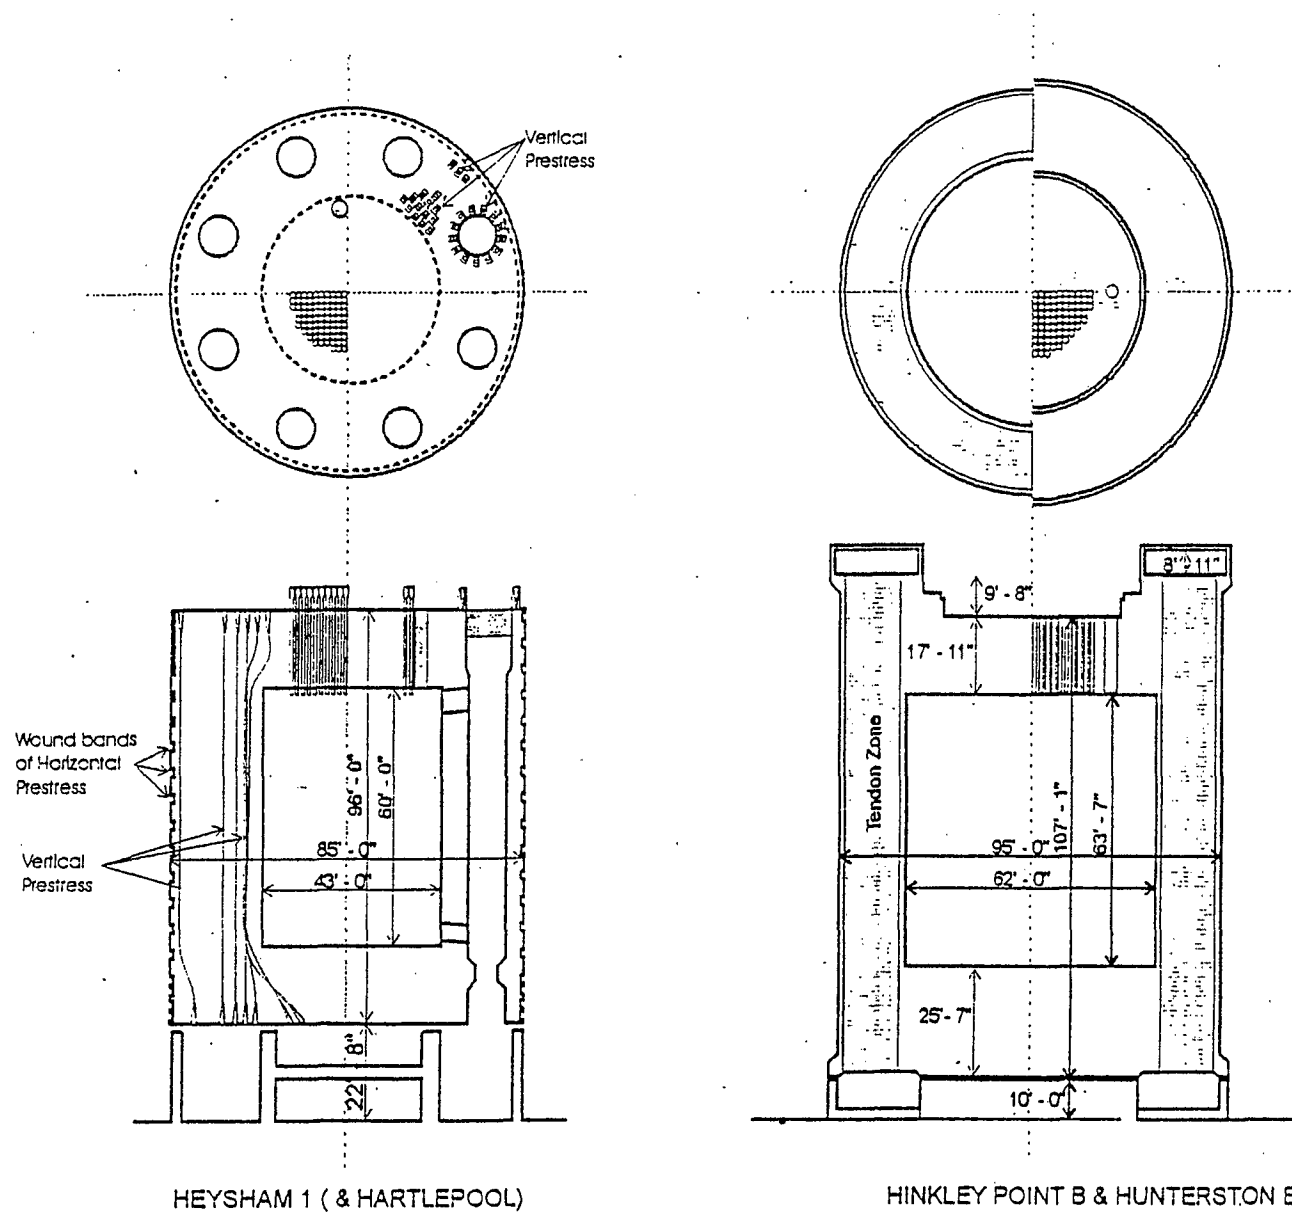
Plans and sectional elevations of Hartlepool (& Heysham 1) and Hinkley Point B (& Hunterston B)
